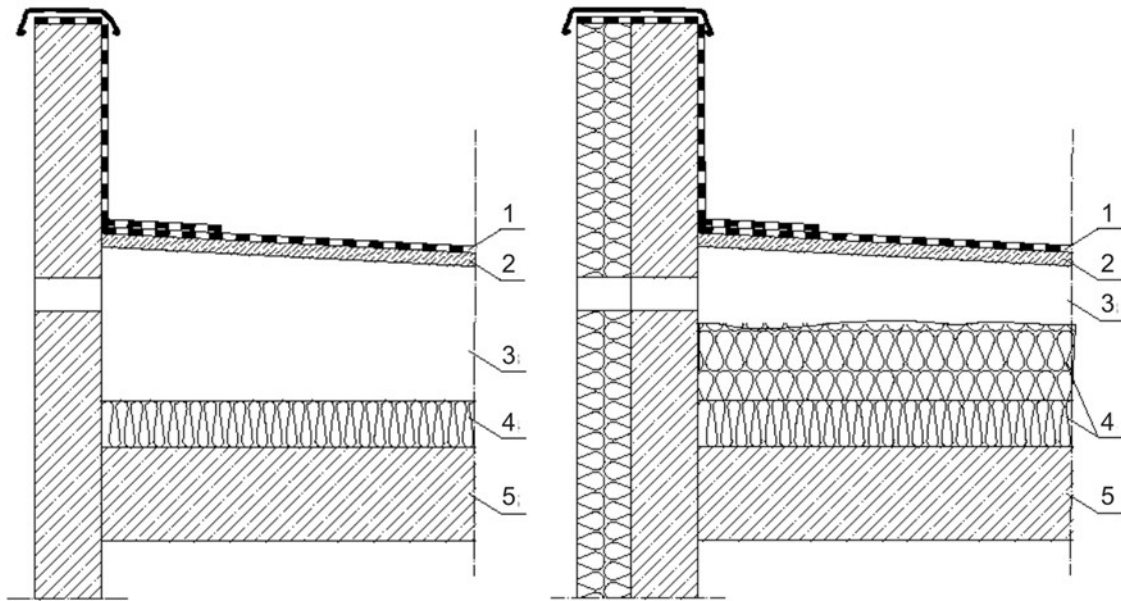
Retrofitting a ventilated flat roof: 1 – top protective layer, 2 – structural layer, 3 – air cavity, 4 – thermal insulation, 5 – ceiling
